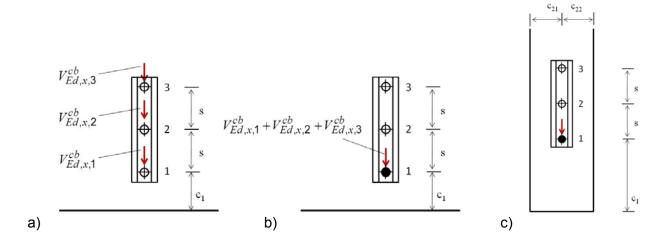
Determination of the shear load for anchor channels situated and loaded transverse to the edge
